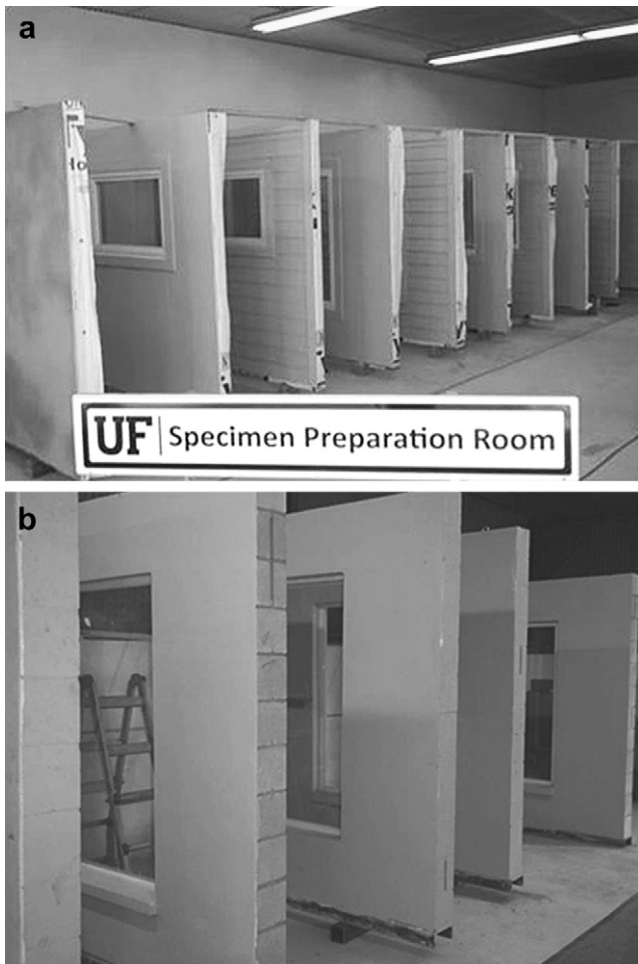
Wall specimens. (a) Wood frame wall specimens staged during construction. (b) Concrete masonry wall specimens staged during construction.
